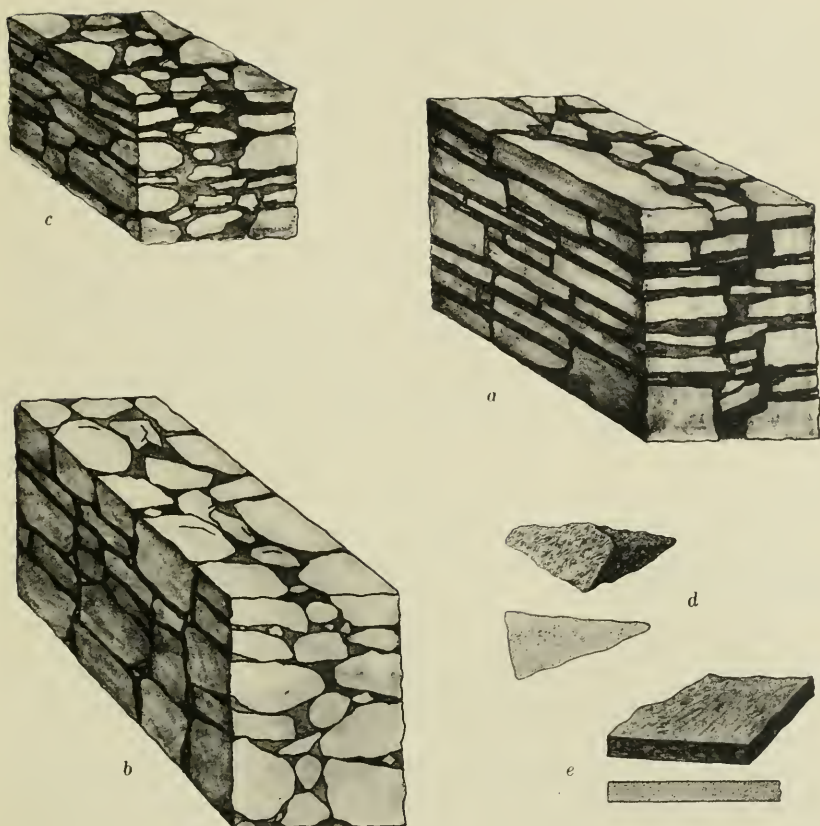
Schematic drawings of masonry types and spalls prevalent at Lowry Pueblo and the different features of masonry technique shown by dissecting a wall. *a*, Essential points found in a Chaco-like wall. Note the mud cushions separating the stones and the spalls, the consistent use of "stop" spalls to hold back the mud mortar, and the natural tendency towards coursing. *b*, Non-Chaco or block-like technique in which the wall-load is transmitted downward mostly through the stone-to-stone contacts, the mud merely filling the voids. *c*, The technique that appears somewhat like both types *a* and *b*. Drawn to a larger scale, sketches *d* and *e* bring out the characteristics of the two kinds of spalls: *d* shows a "false" spall, which is wedge-shaped; *e* shows a "stop" spall which is flake-like.
